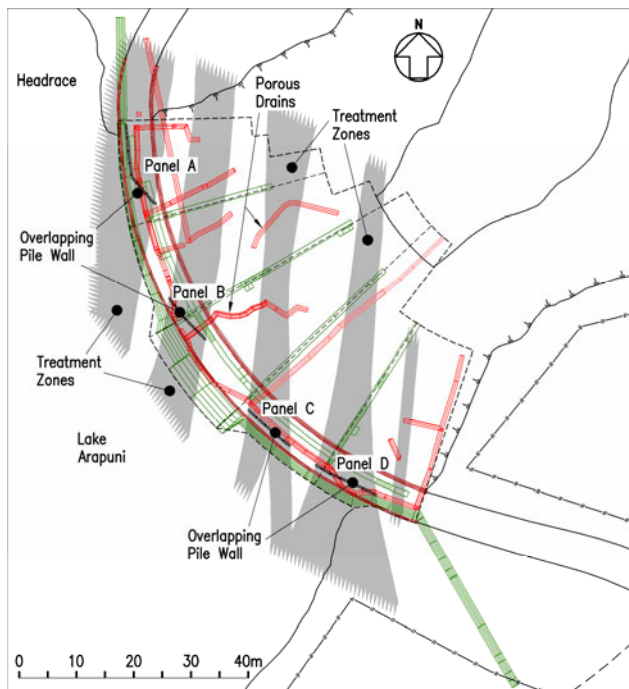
Plan of long-term seepage control remedial works, with cutoff walls, treatment zones and underdrain
